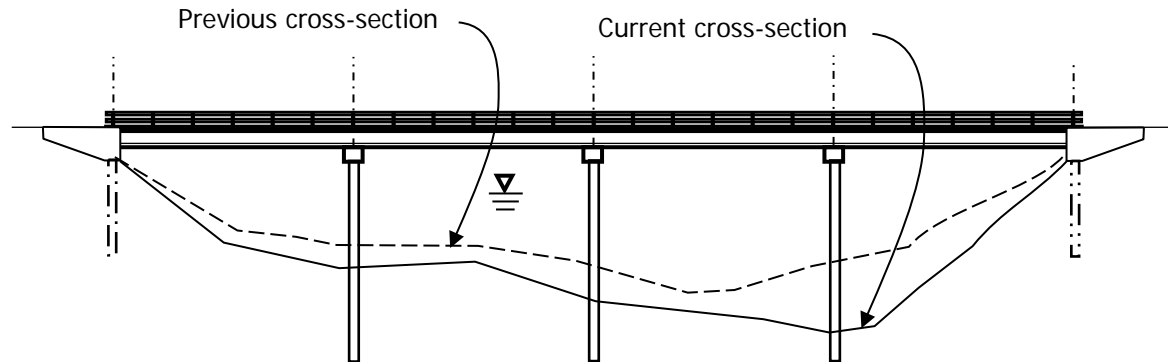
Elevation view showing current cross-section and previous cross-section for a bridge over water.
